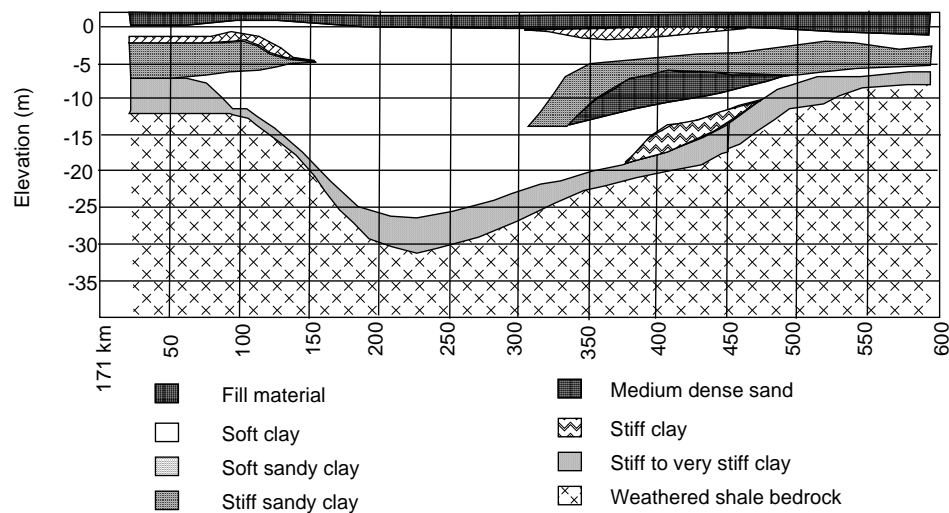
Typical soil profile at the Sandgate Rail Grade Separation Project (after Indraratna et al. 2010)
